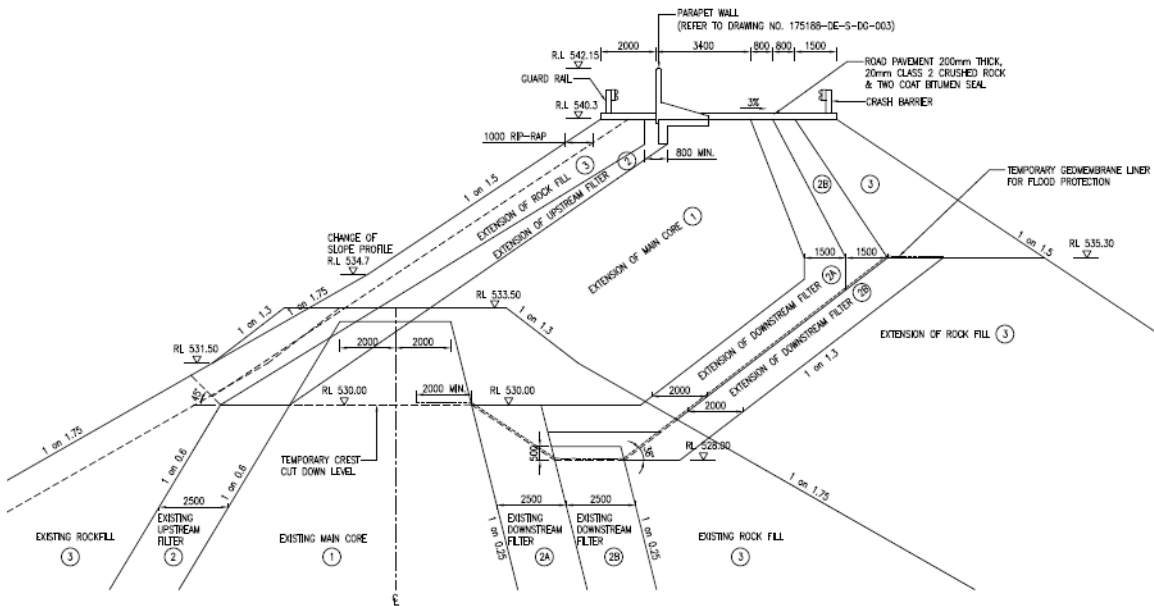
Proposed zoning details between old and new construction near the existing embankment crest.
